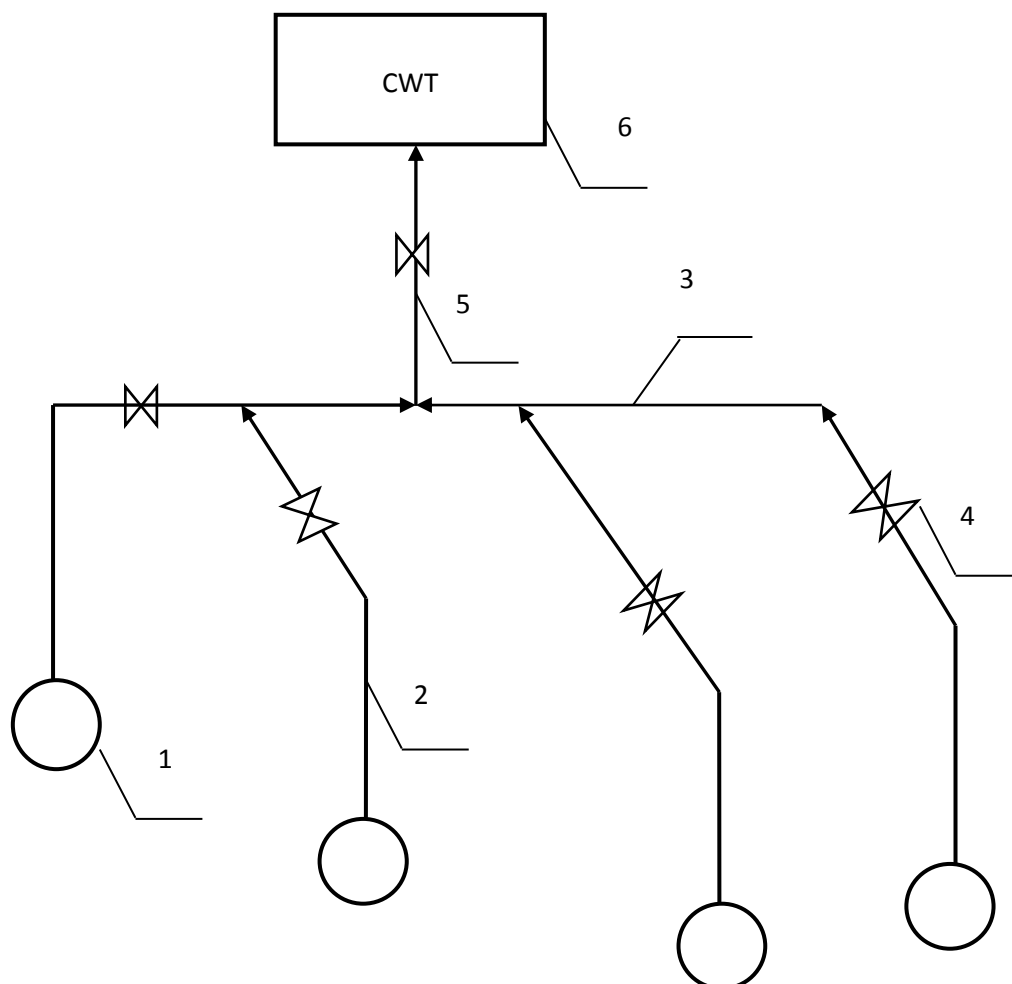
Scheme of location of water intake facilities: 1 - wells with submersible pumps; 2 - pressure pipeline; 3 - prefabricated water conduit; 4 - shut-off and control valves (controlled throttles); 5 - main water conduit; 6 - clean water tank (CWT)
